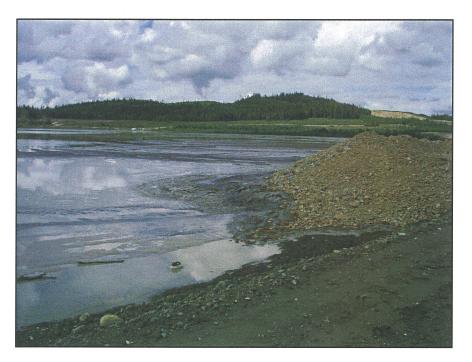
CBL placement on the tailings beach at the Perimeter Embankment.
